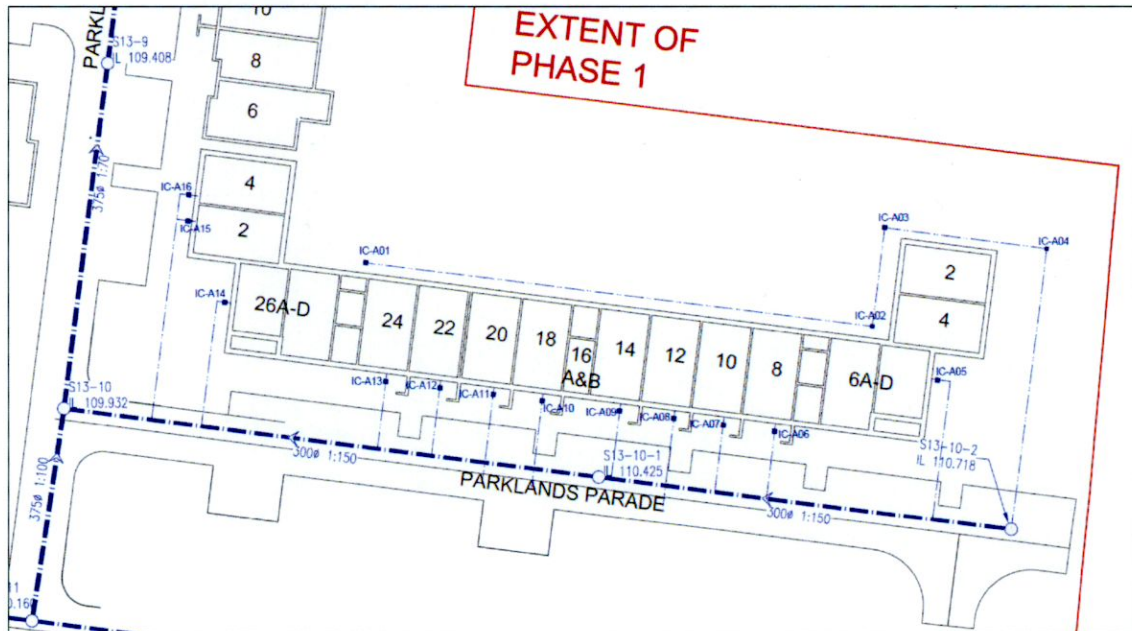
Stormwater drainage layout serving duplexes [Extract from as-built drawings]
